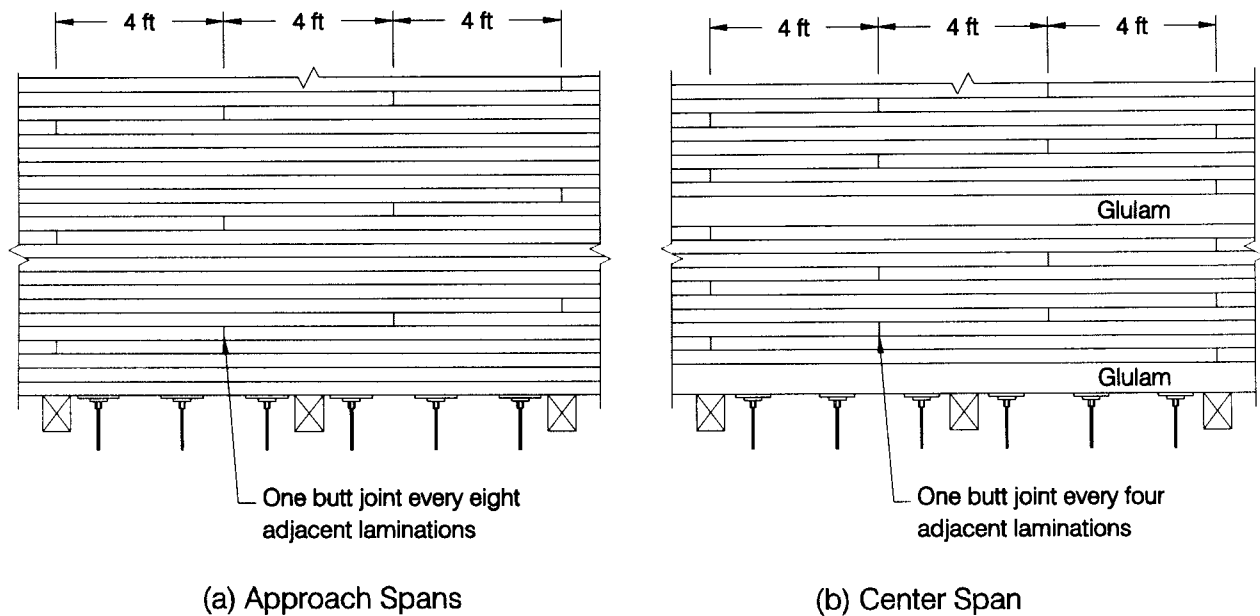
Butt-joint configuration used with Eastern Hemlock deck laminations for the (a) approach spans and (b) center span on the Big Erick’s bridge. A butt joint was placed transverse to the span in every (a) eighth lamination on the stress-laminated decks and (b) fourth lamination on the stress-laminated box. Longitudinally, butt joints in adjacent laminations were separated by 4 ft.
